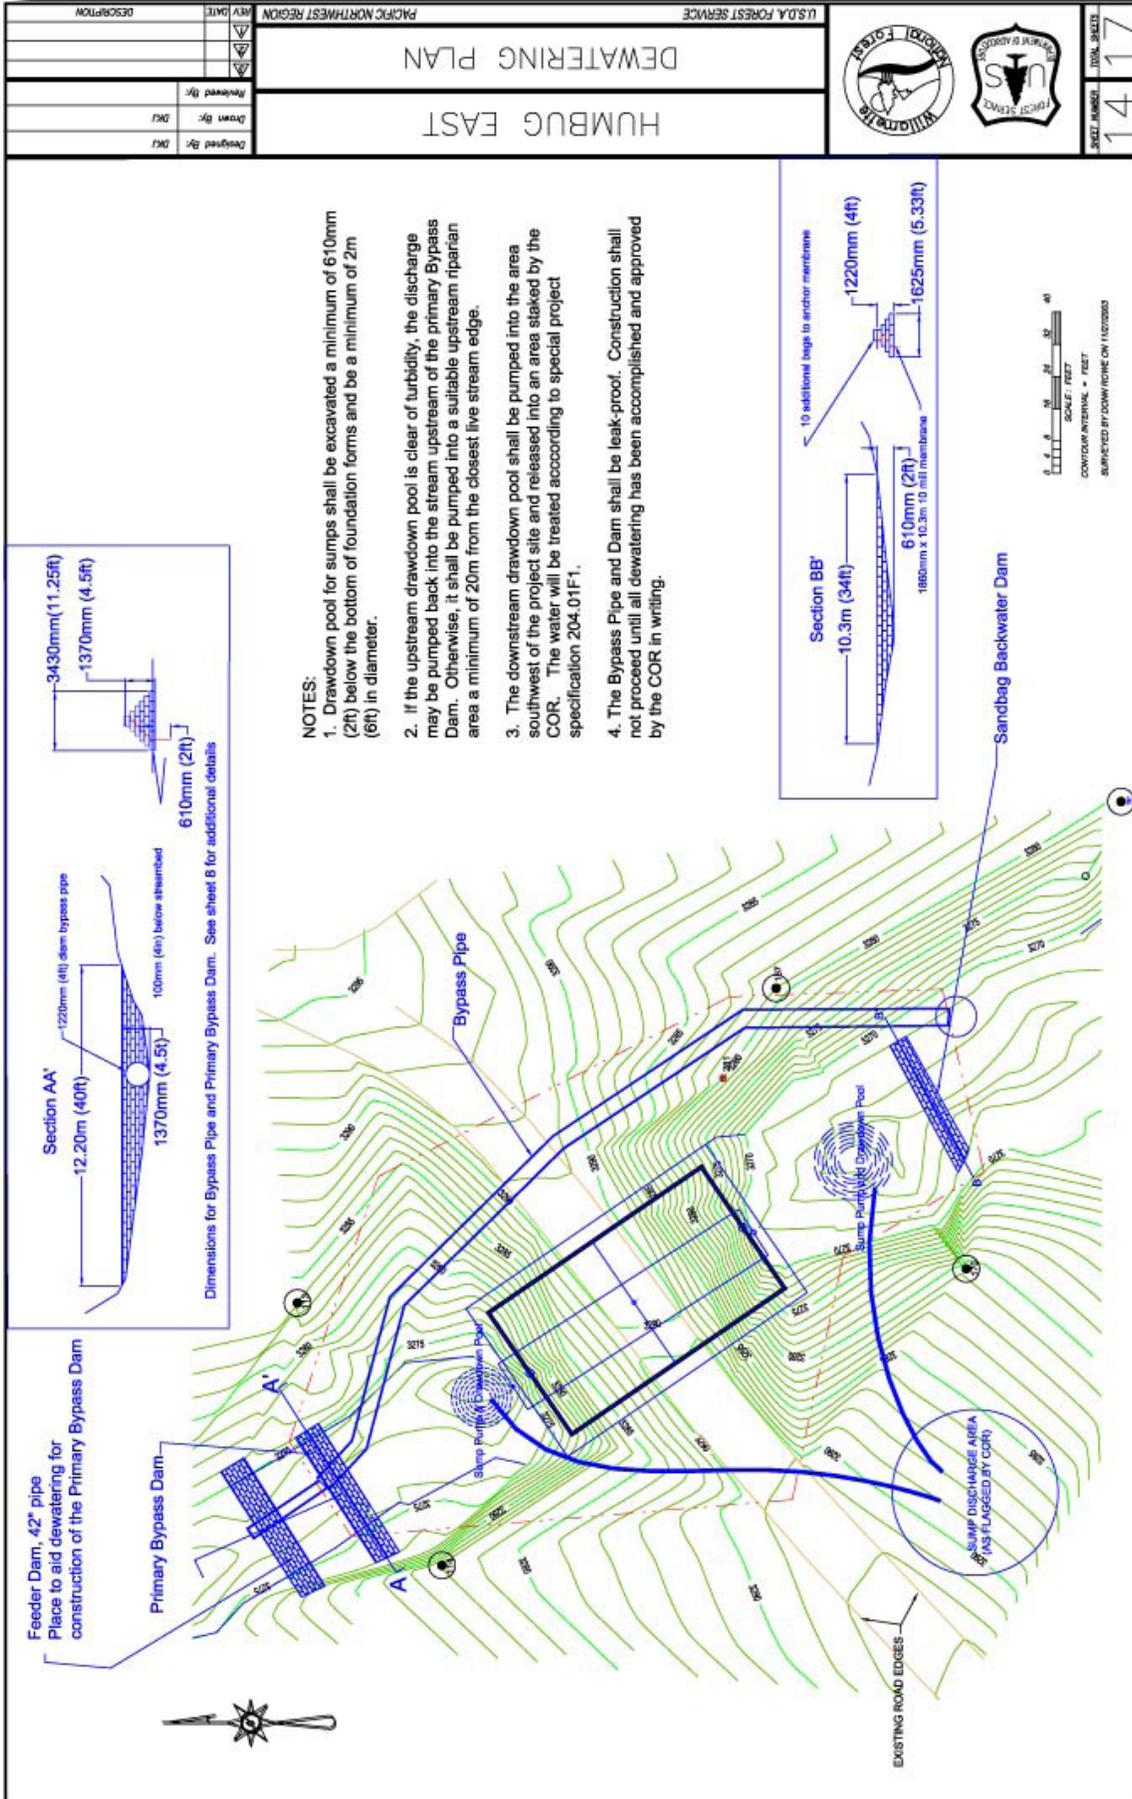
Humbug East Sheet 14 - Site Plan with Dewatering System.
